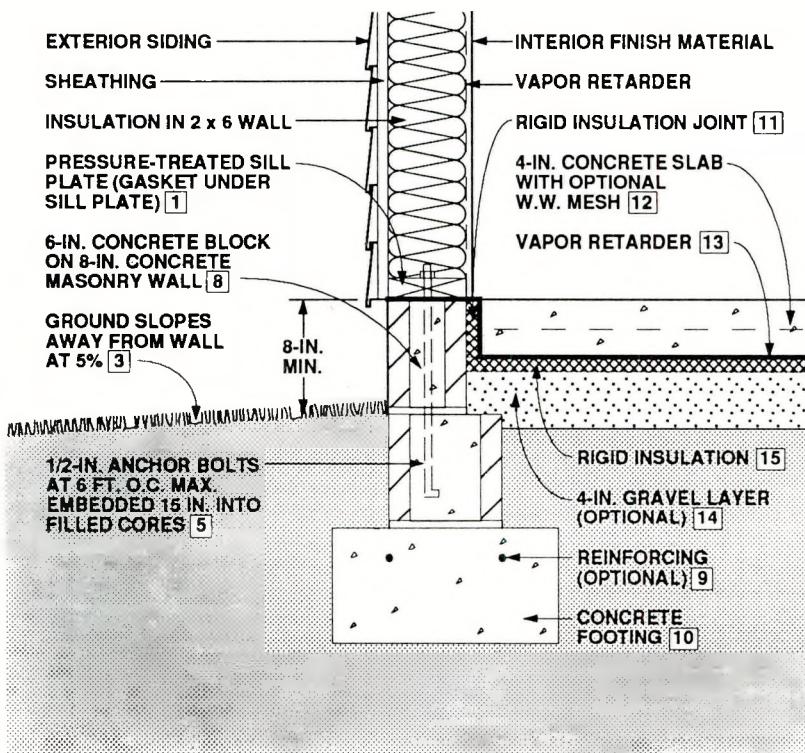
Slab-on-Grade with Masonry Wall (Insulation Under Slab)
